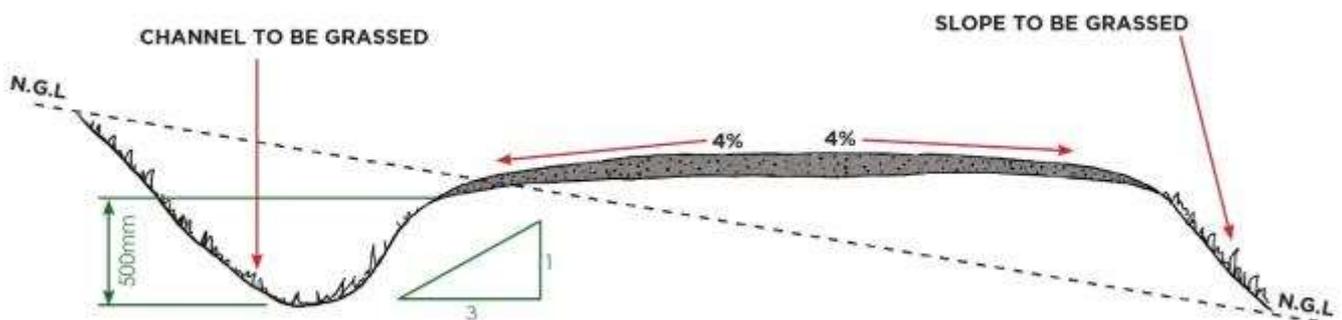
DESIGN OF A ROAD ON A SLOPE WITH A GRASSED DRAINAGE CHANNEL
